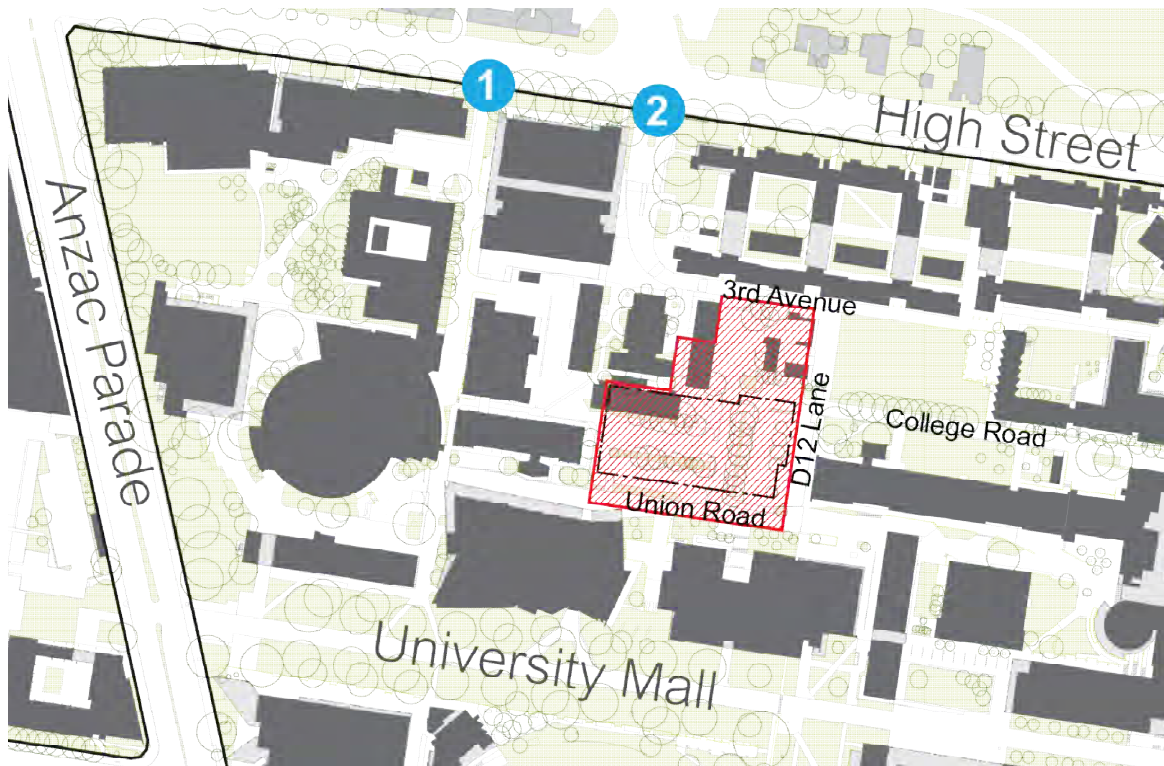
Location of MS&EB construction site, D12 Lane, and the need to maintain UNSW vehicular access to 3rd Avenue, College Road and Union Road and pedestrian access off Gate 2 to the remainder of the UNSW Kensington Lower Campus. The larger version of the MS&EB Campus Location Plan is provided in Attachment A.
